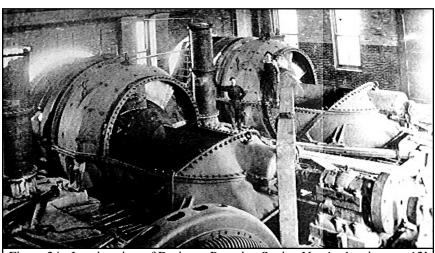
Interior view of Drainage Pumping Station No. 1, showing two 12' Wood screw pumps during installation, ca. 1914-1915 (from Sewerage &Water Board 1914).
